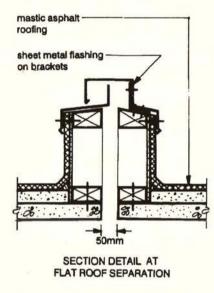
Roof separation between blocks of a Wellington building. Note the width of the flashing.
